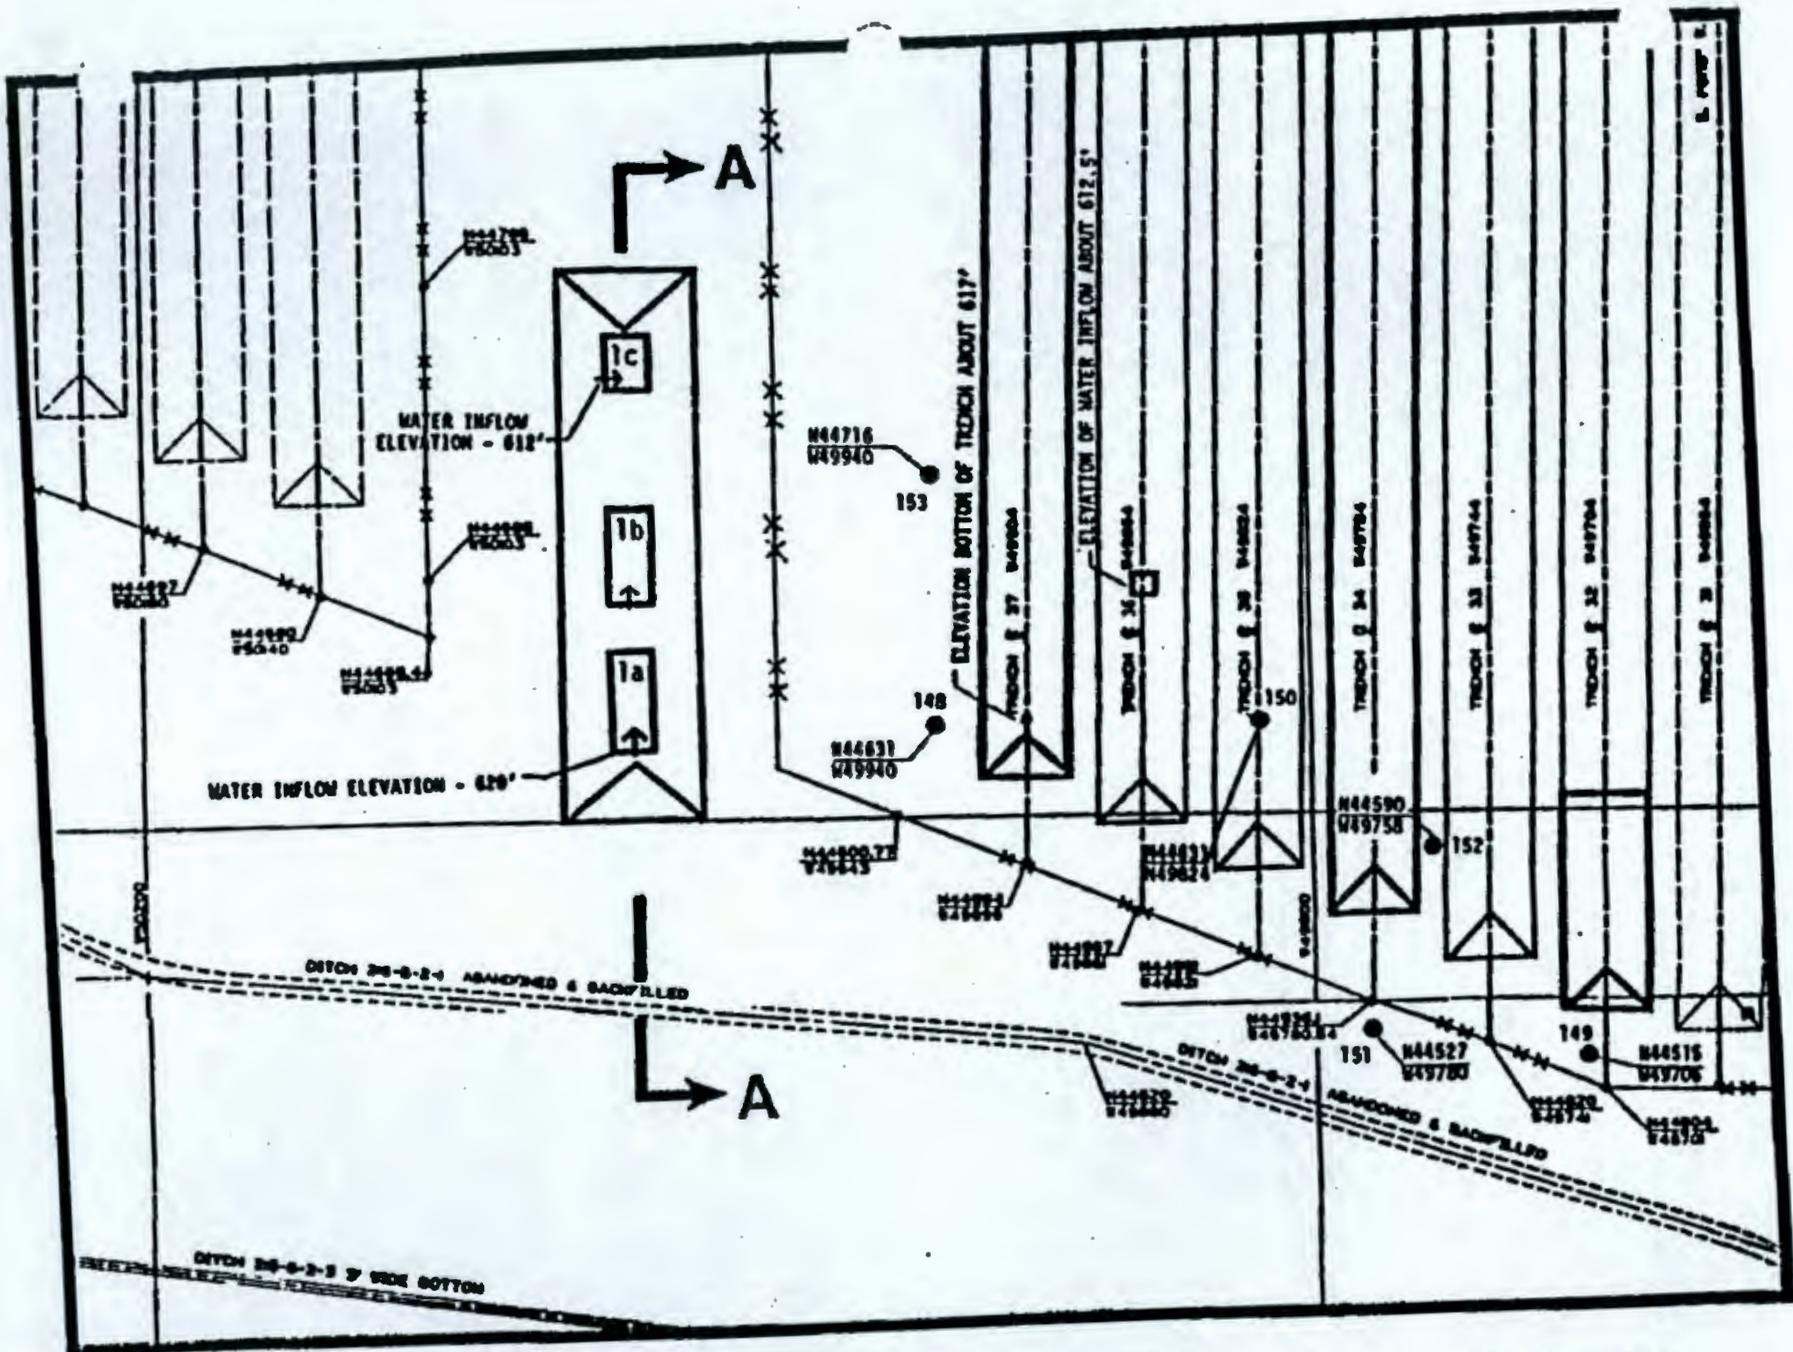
Location of burial trenches, boreholes and excavation trenches in the 218-E-12B burial ground near burial trench 36. Filled burial trenches are accented in black.
